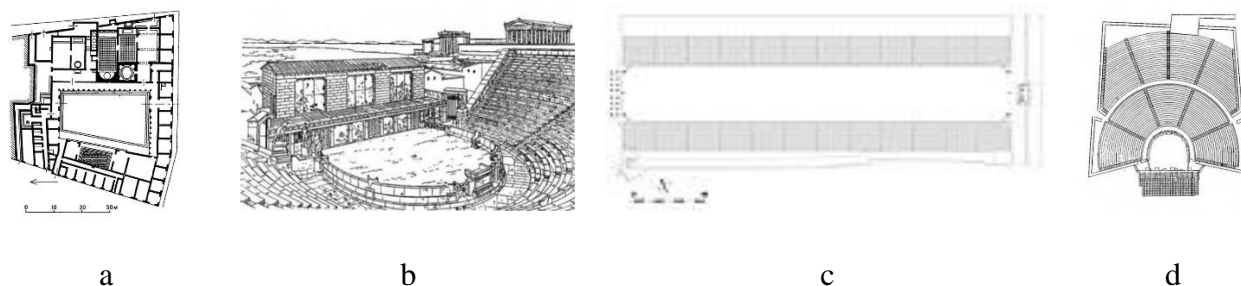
Ancient buildings as a place of intercultural dialogue: a) Stabian Baths, plan, Pompeii [4]; b) Theatre in Priene, reconstruction of general view with skene; c) Theatre in Priene, plan. [5]; d) the stadium in Miletus, plan [1]
